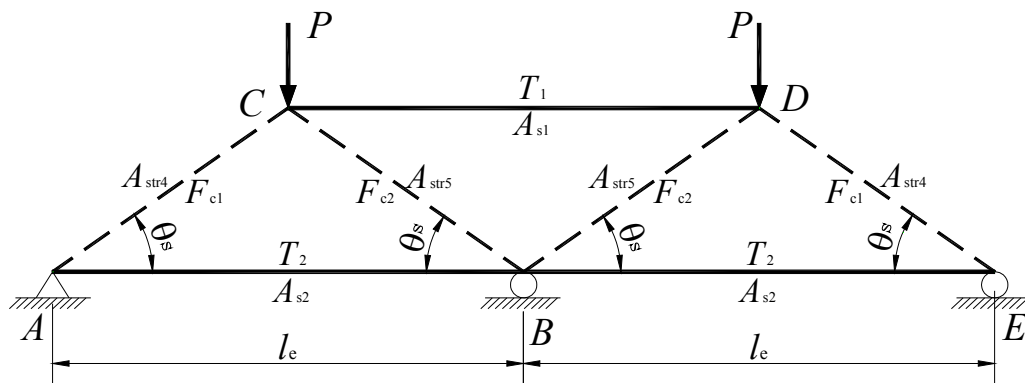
Truss model for two-span CDB on Rigid Supports
